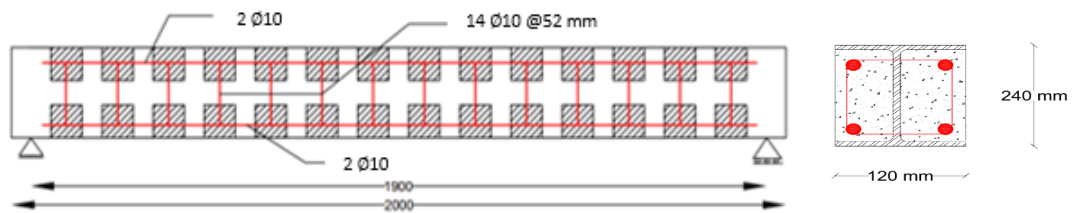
Schematic of the test specimen(all dimensions are in mm)
